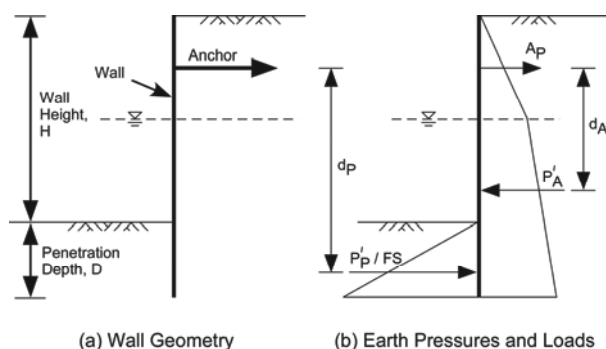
Typical sheet pile wall section and forces acting on the wall.
